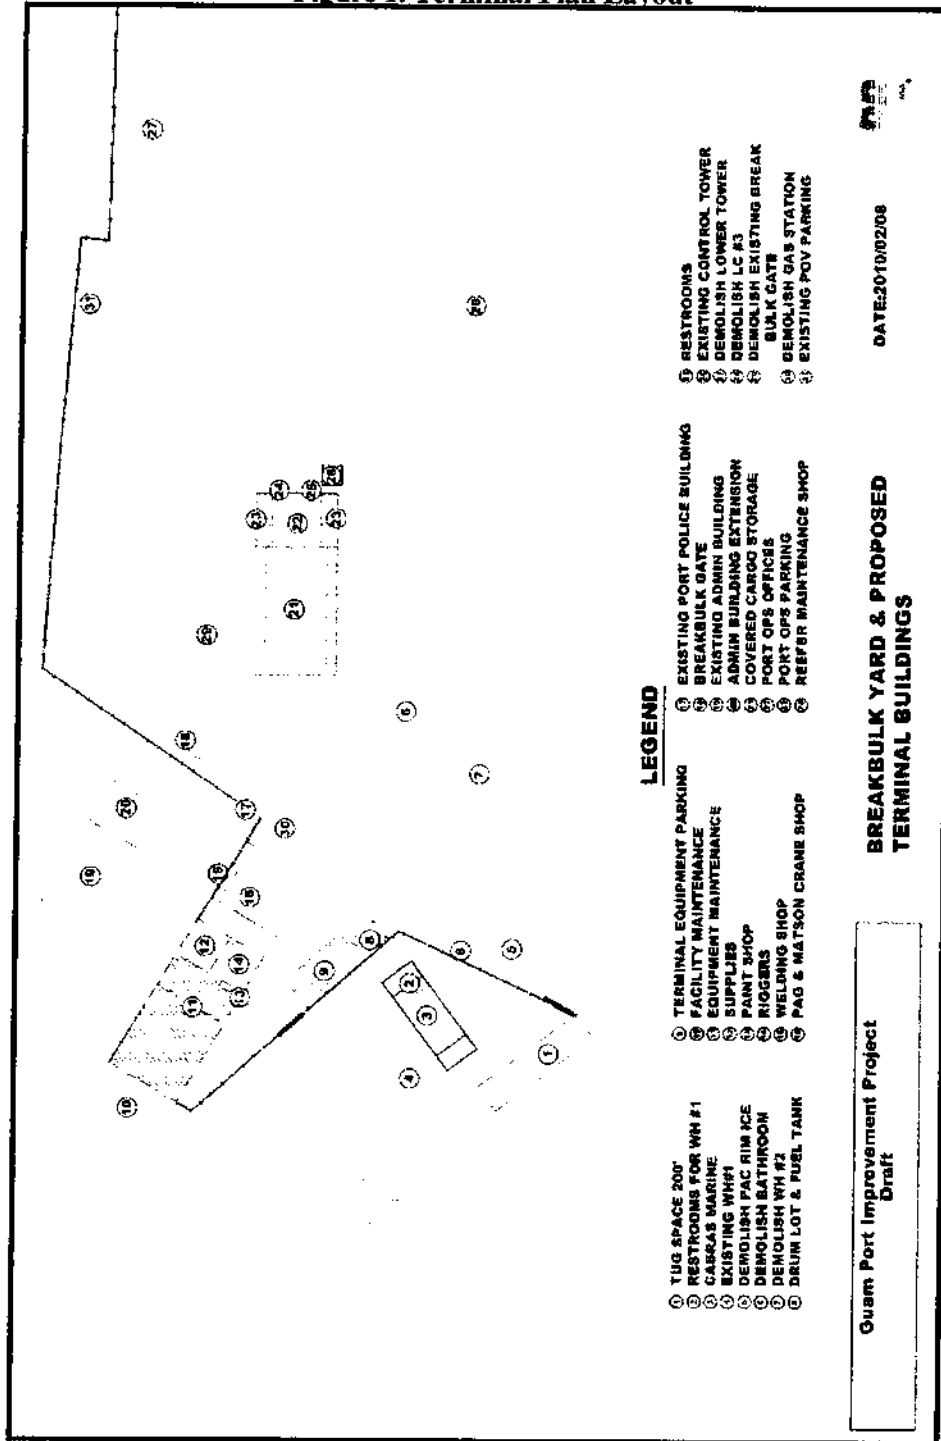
Breakbulk Yard and Proposed Terminal Buildings
